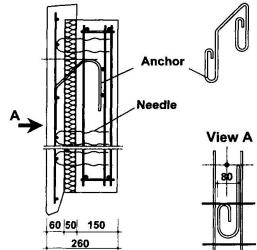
Structure of the external wall - type WBS 70 in cross section
